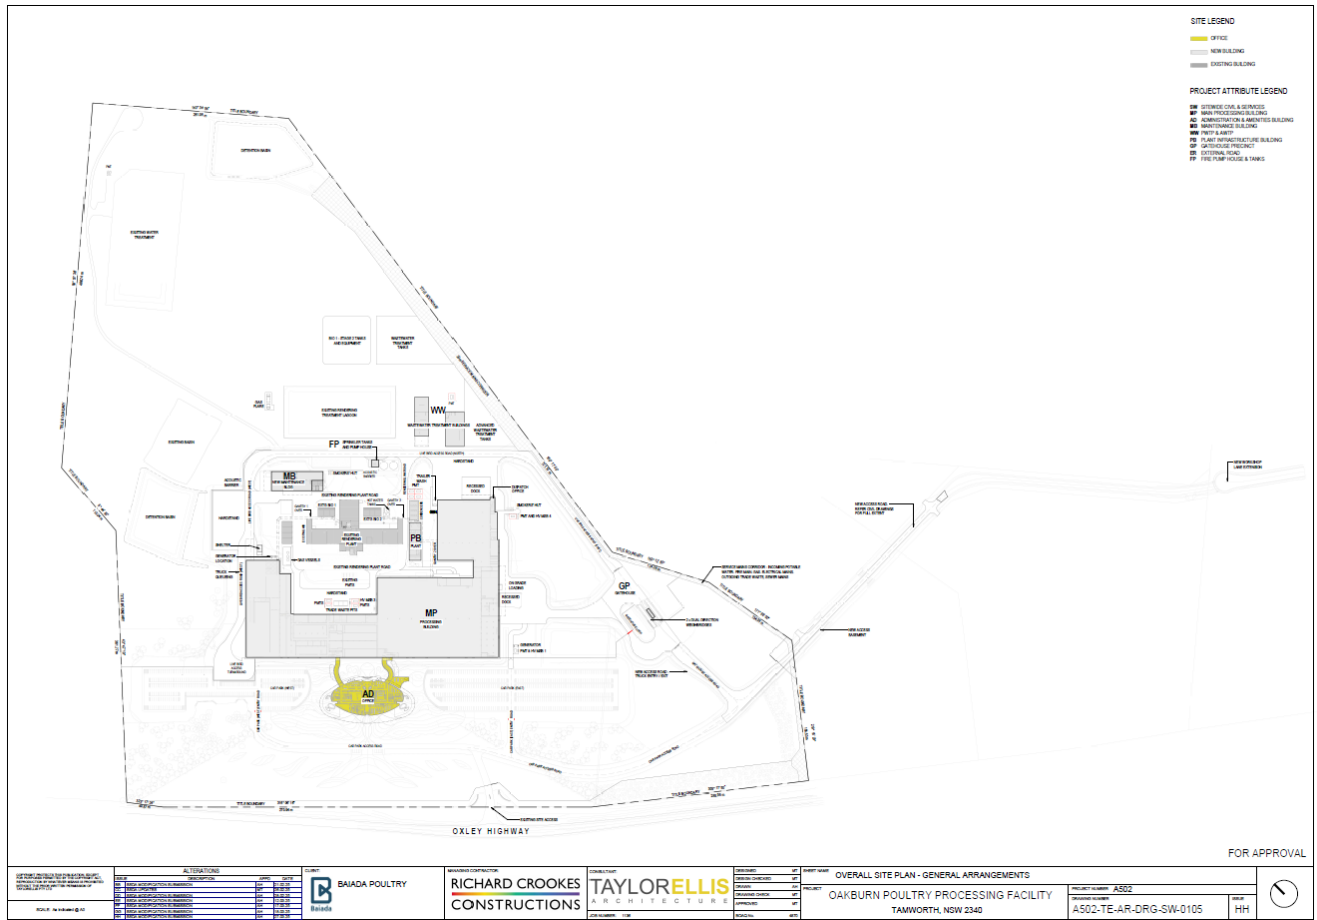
Current Site Plan (As per SSD-9394-MOD-3)
